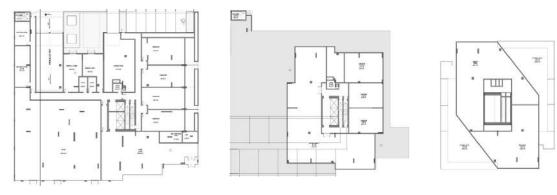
Floor plans at Level 1 (ground, left), Level 3 (podium, middle) and Level 27 (roof, right)
